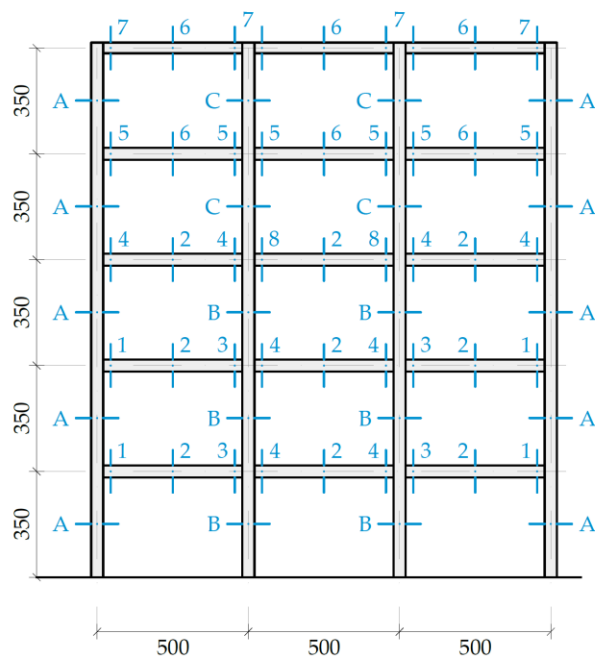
Indication of the main sections of beams and columns of frame "DCH".
